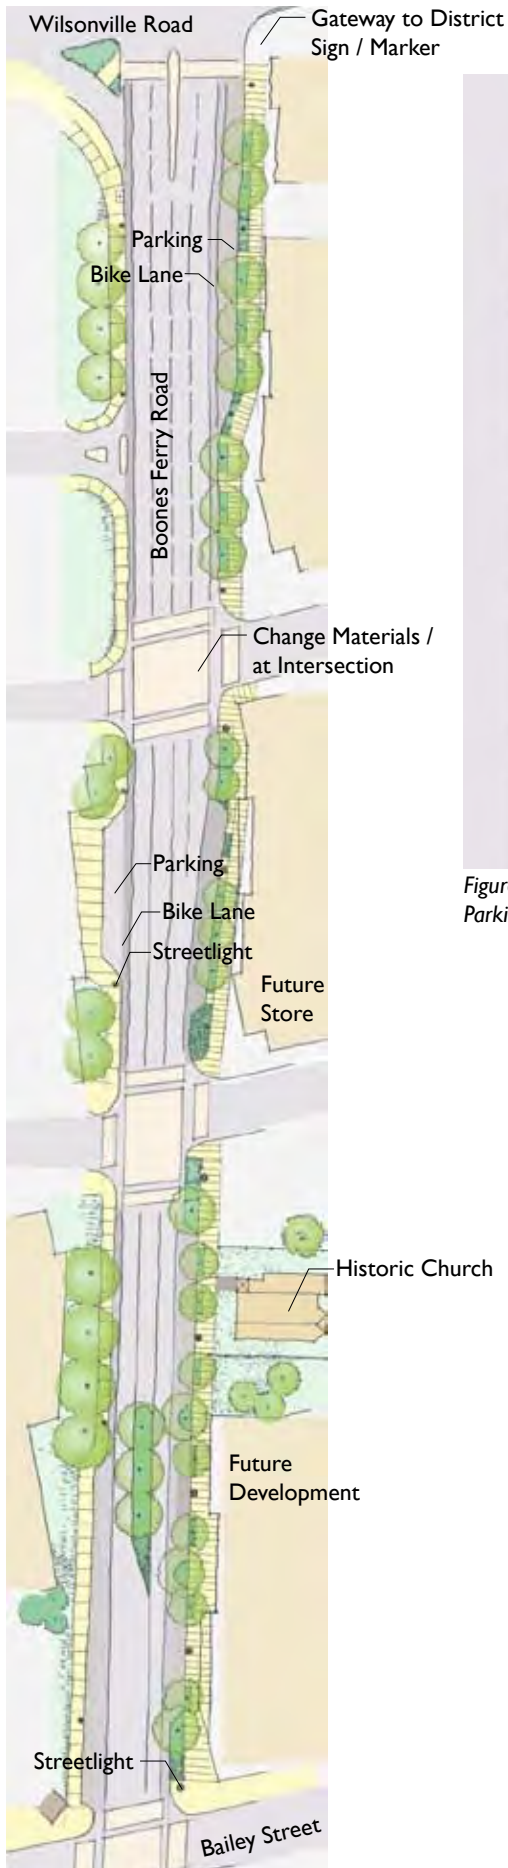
Wilsonville Road to Bailey Street Proposed Plan
